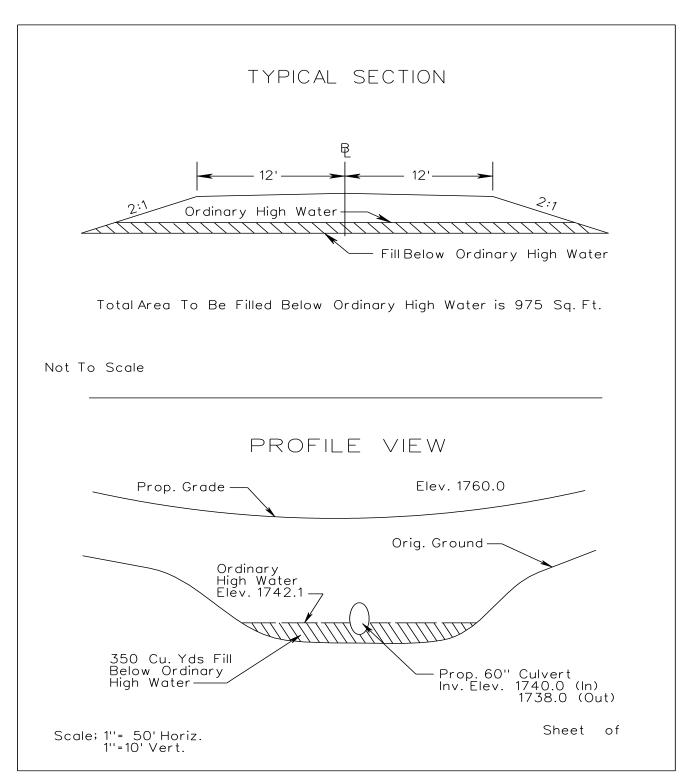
CULVERT (NON-TIDAL) - TYPICAL SECTION AND PROFILE VIEW
